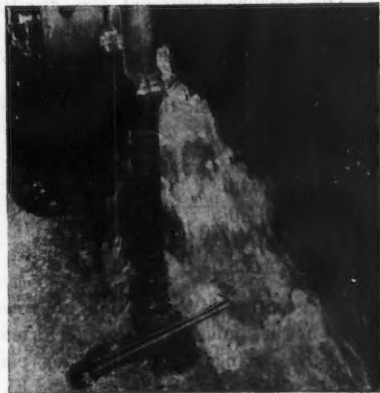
FLOW OF WATER FROM FOUNDATION GROUT HOLE
